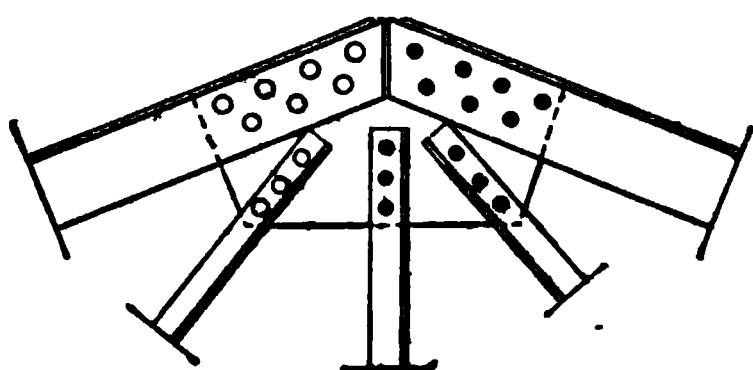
Detail of Joint G, Fink Truss, Fig. 7
